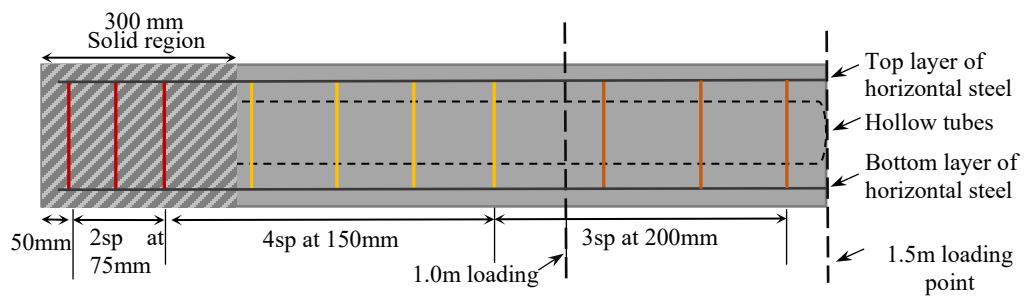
10:Stirrups layout on the girder up to 1.5m load point.
